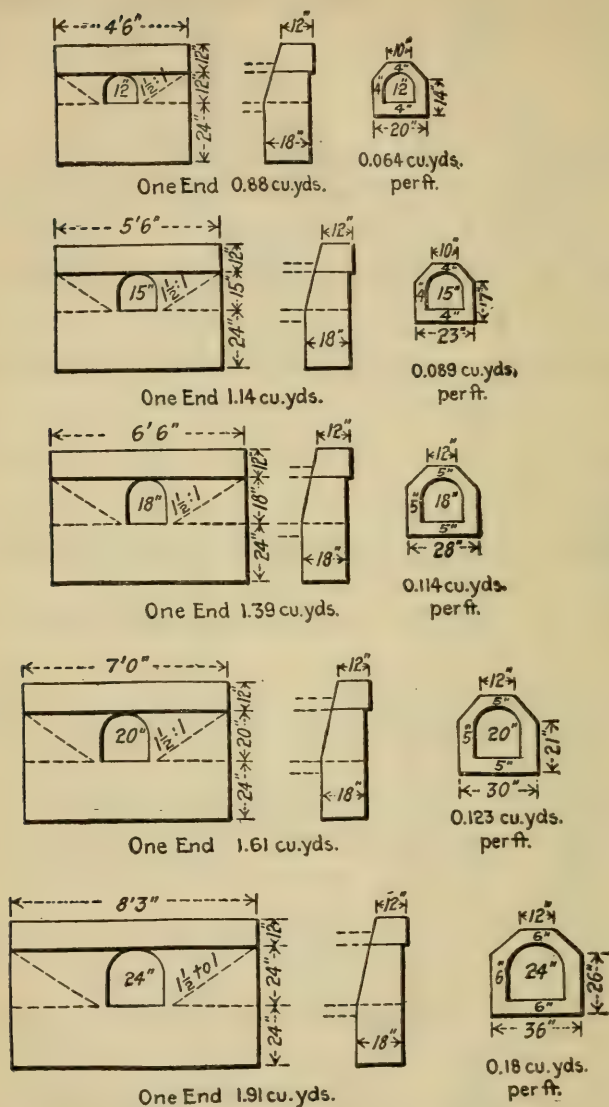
A.—Massachusetts standard for concrete arch culverts.
